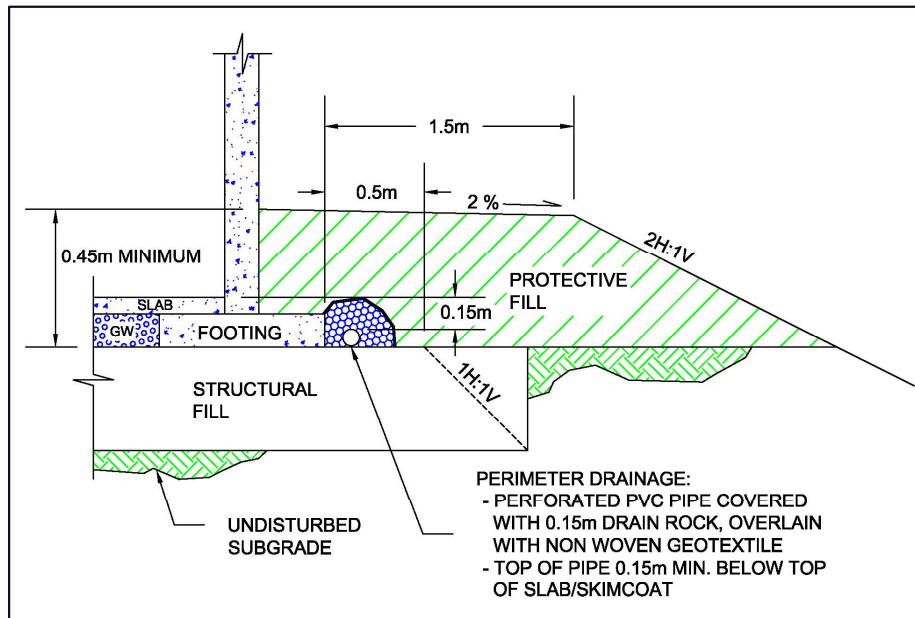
Typical Section, Structural Fill in Proximity to Foundations (applied to proposed sites and roadways)
